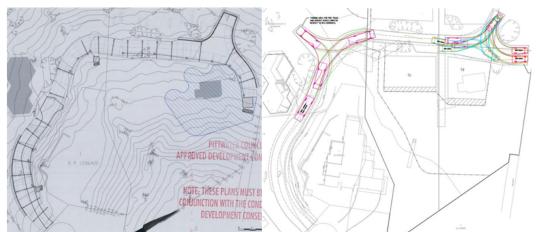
Extracts of the approved plans from Development Consent No. No274/09 (left) and proposed driveway plans (right) comparing the differences between the approved driveway and proposed modifications.
